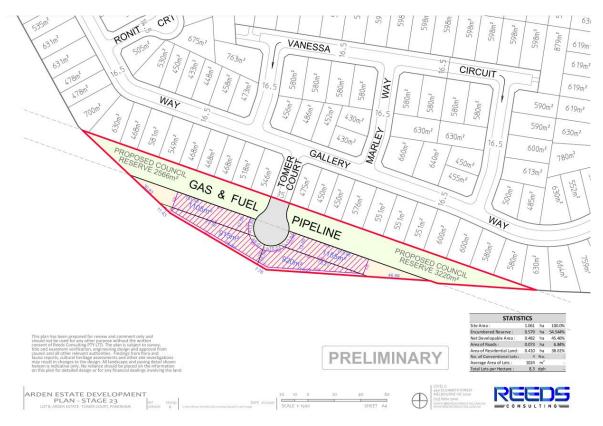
Proposed Subdivision Plan, Version B, dated 02/12/202
